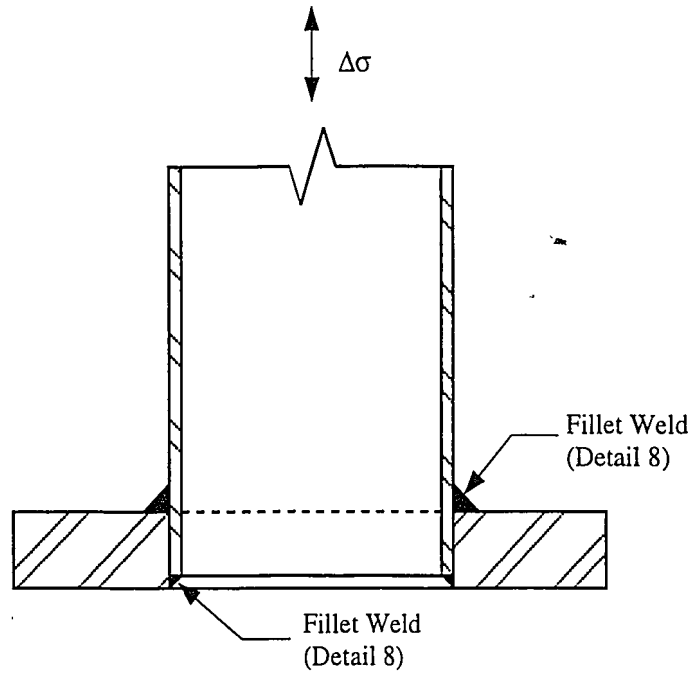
Fillet-Welded Socket Connection.
